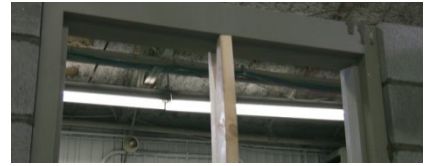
TYP A HIGH PSI PREFAB CONCRETE LINTEL IS USED, ALTHOUGH PROPER STEEL LINTELS MAY ALSO BE SPECIFIED. REF NON-TORNADO SDI/ALLEGION MASONRY INSTALL VIDEO min 7:50-8:30. ENSURE NO SAGGING.
